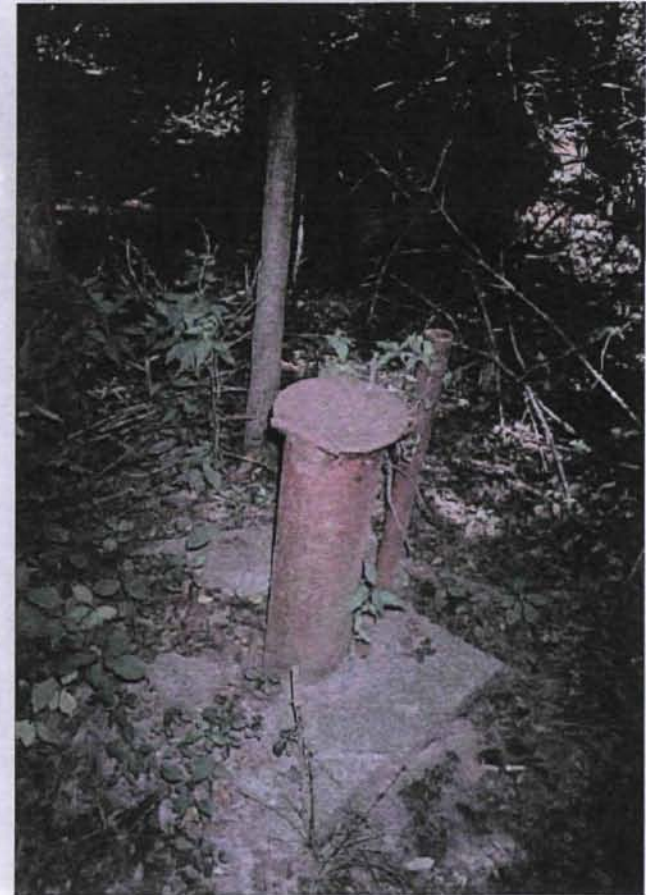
Monitoring Well (MW) B4 located in the southeast corner of the property along West River Road. The well is rusted shut and has a cracked concrete pad.
